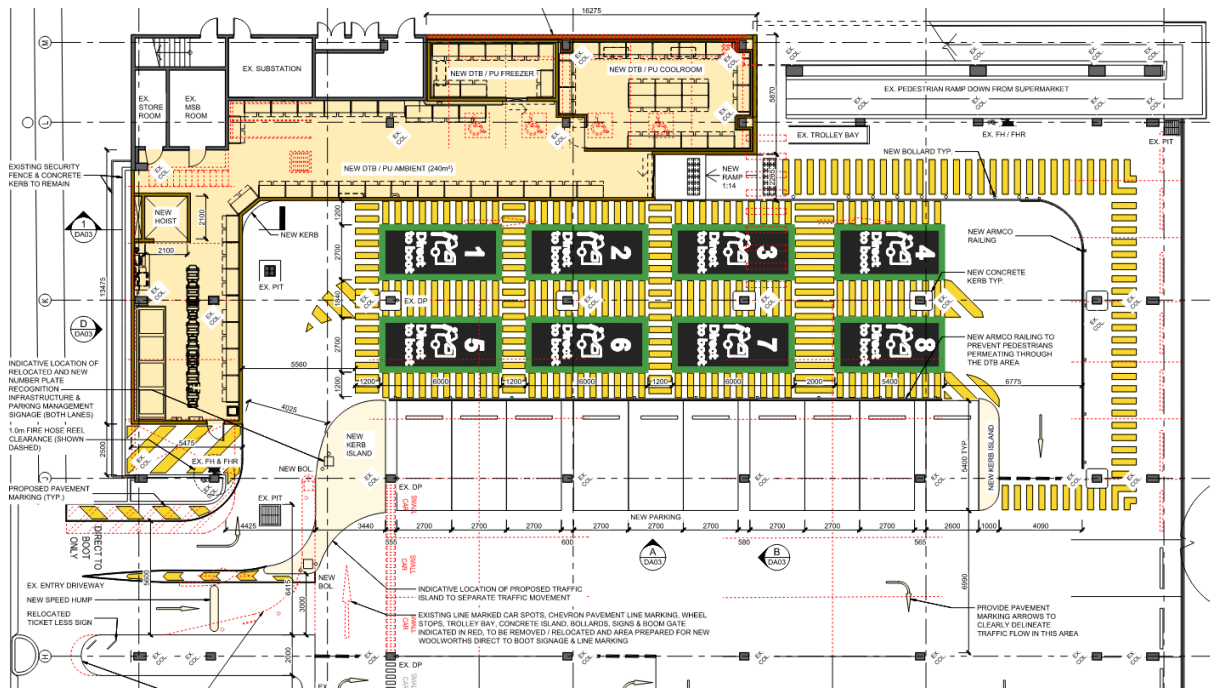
Extract: Mona Vale DTB – Proposed Basement Plan (MCHP Architects)
